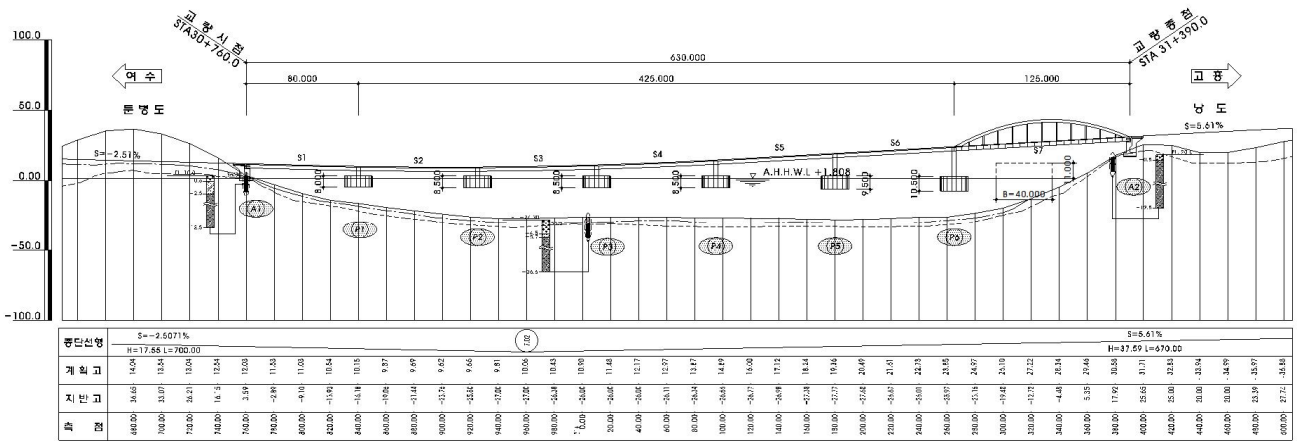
Longitudinal section view of the floating steel box girder bridge
